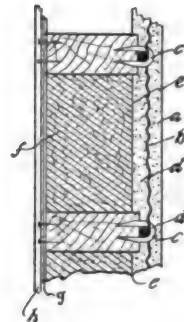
DETAIL OF WALL HORIZONTAL SECTION
